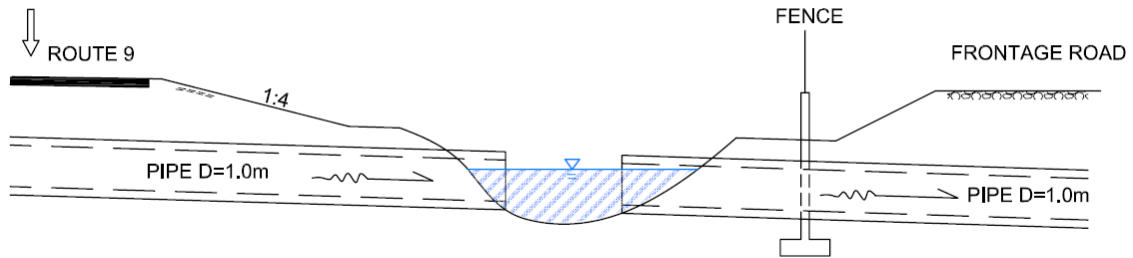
Catch Basin and Outlet Structure not Inside or Outside of Fence
